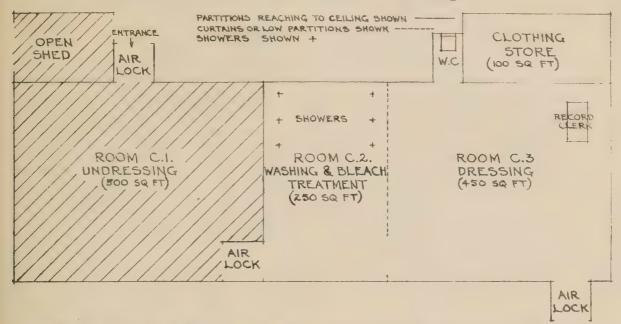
Lay-out of Section C—Cleansing (Unwounded) for one sex. Sizes are given for a large Post.
